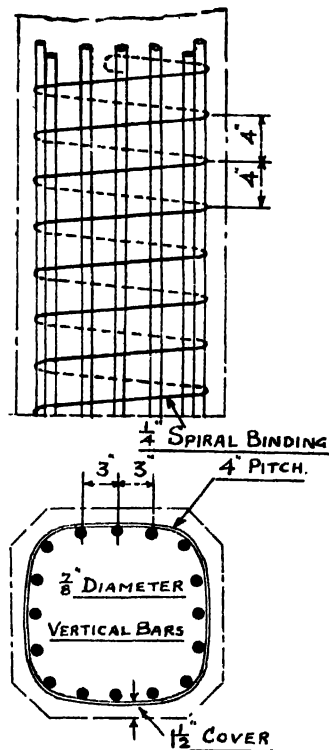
COLUMN REINFORCEMENT (SPIRAL TYPE)
